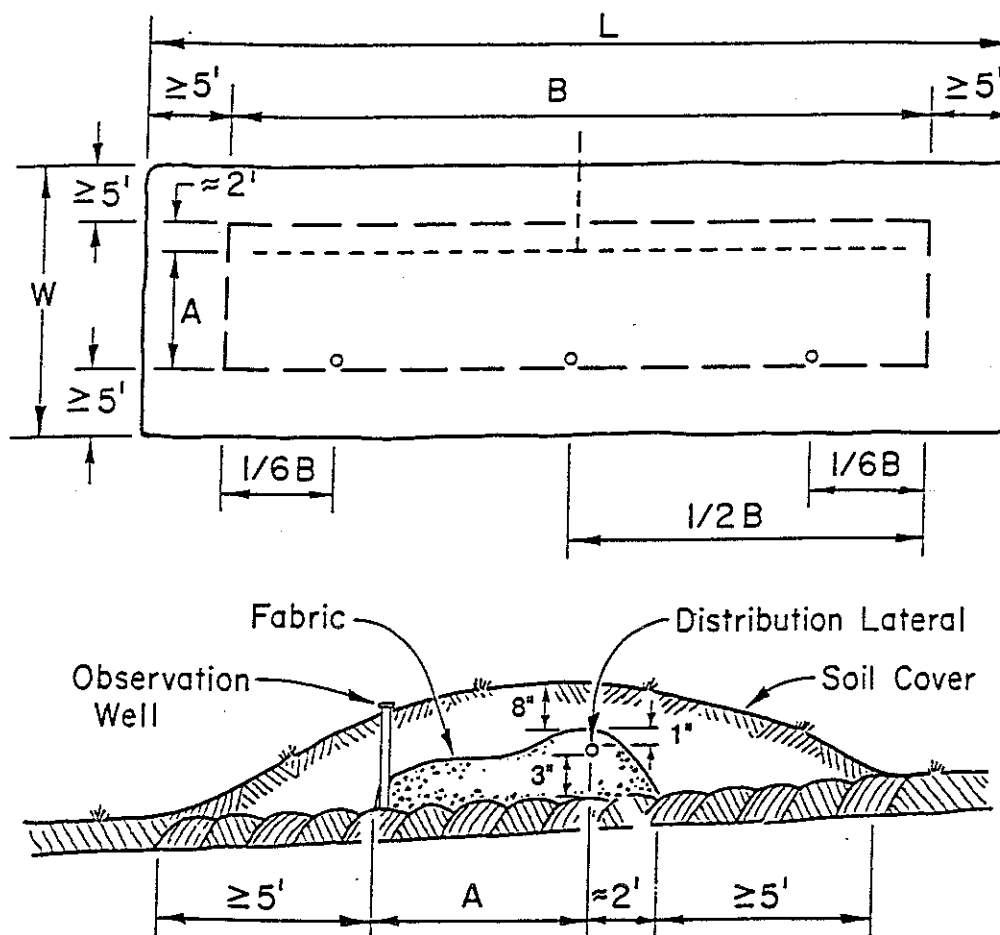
Cross section and plan view of at-grade soil treatment/dispersal unit.
